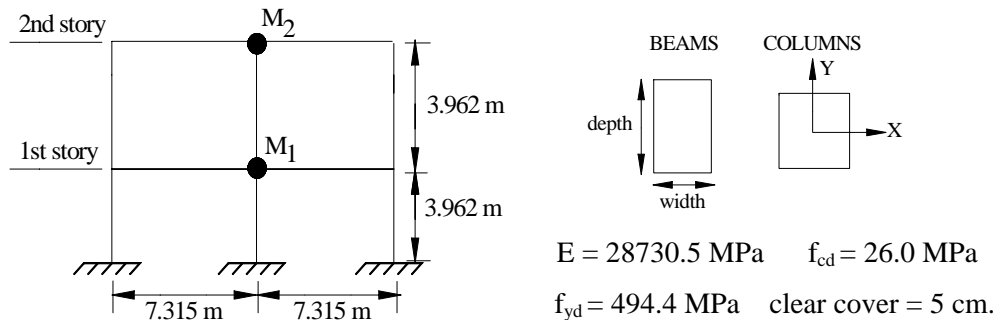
The Configuration of 2-Story Reinforced Concrete Frame
